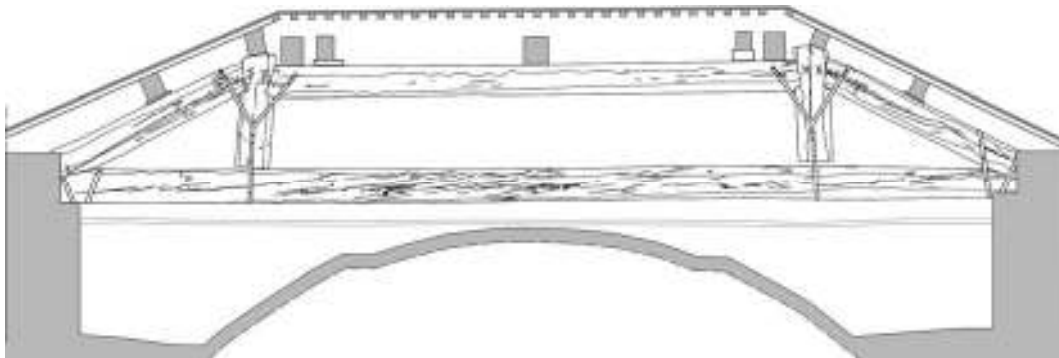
Southern façade of truss 6 (drawing by G. Bolognesi, M. Borreca, A. Chiesa, G. Ferri).
